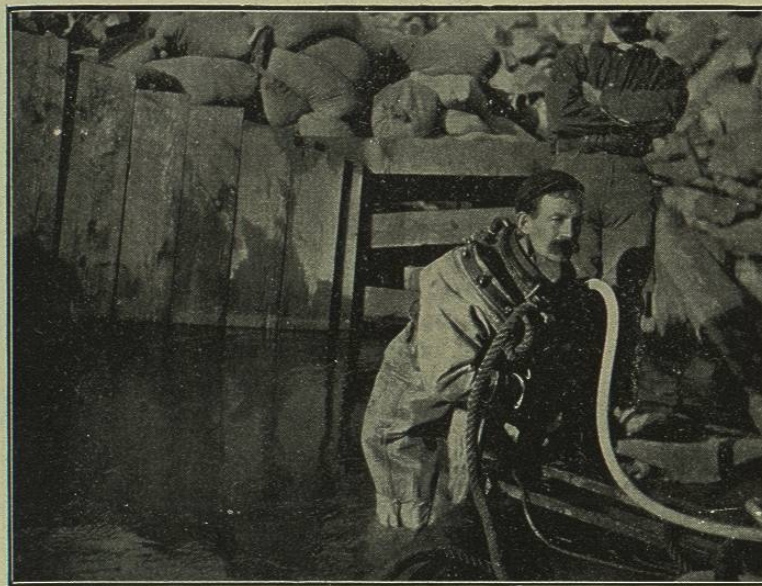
MILNER DAM. DIVERS AT WORK PLACING SHEET PILING IN 40 FEET OF WATER.
